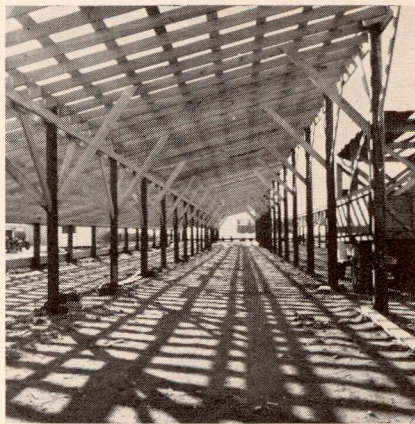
Structural strength and adequate roof support are important. Note braces from poles to prevent movement of building due to wind.
